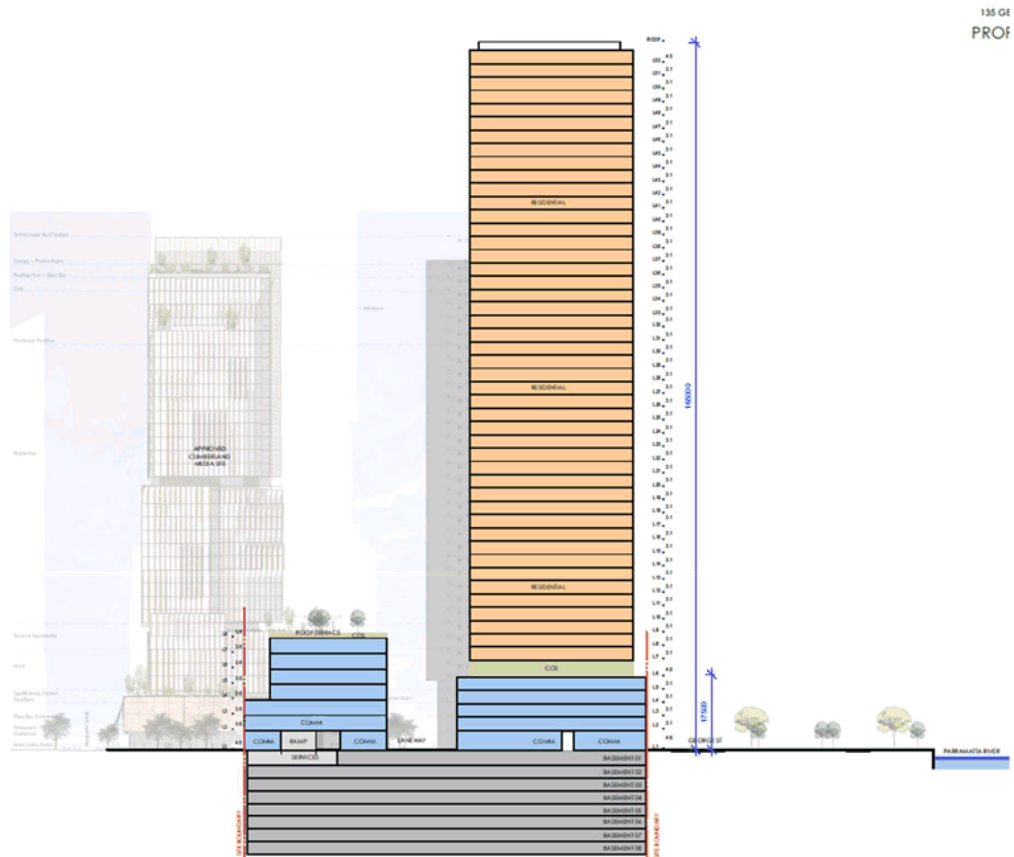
Reference design - East Elevation when viewed from Harris Street.
